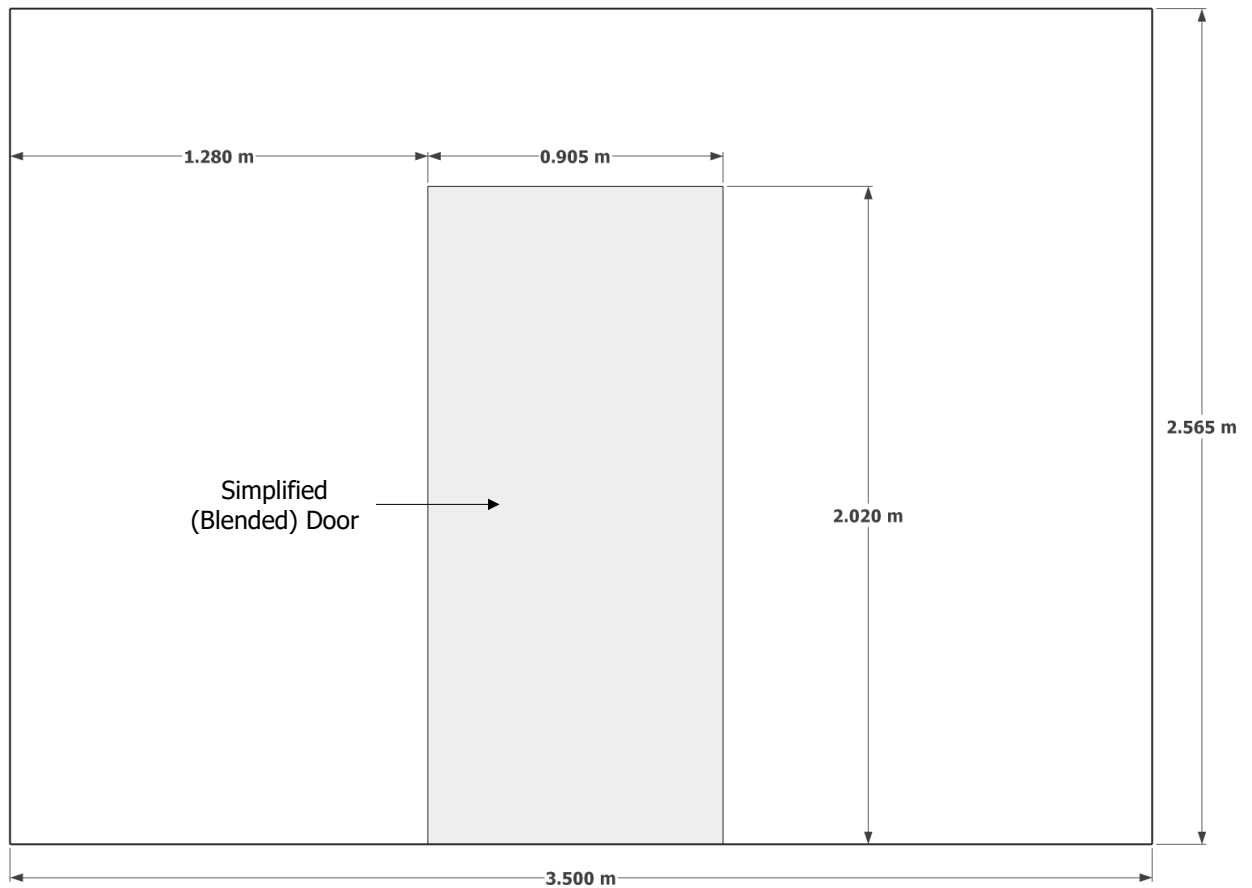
Dimensioned north wall and door elevation, exterior view
